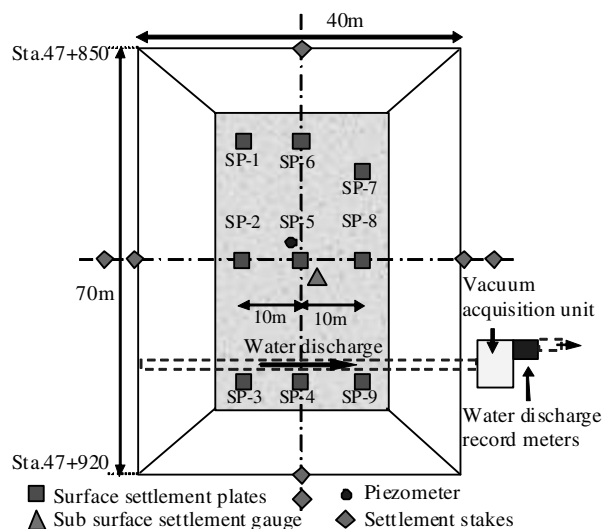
Plan of the embankment and instrumentation layout (Source: Fig. 1, Karunawardena and Nithiwana, 2009)
